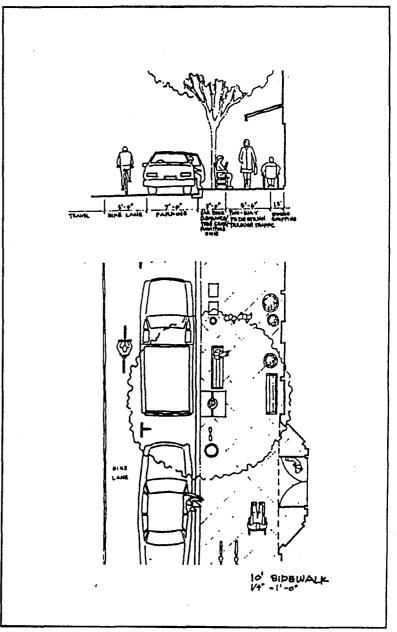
Ten feet provides an opportunity for street furniture to be located along the curb or along the storefronts.
